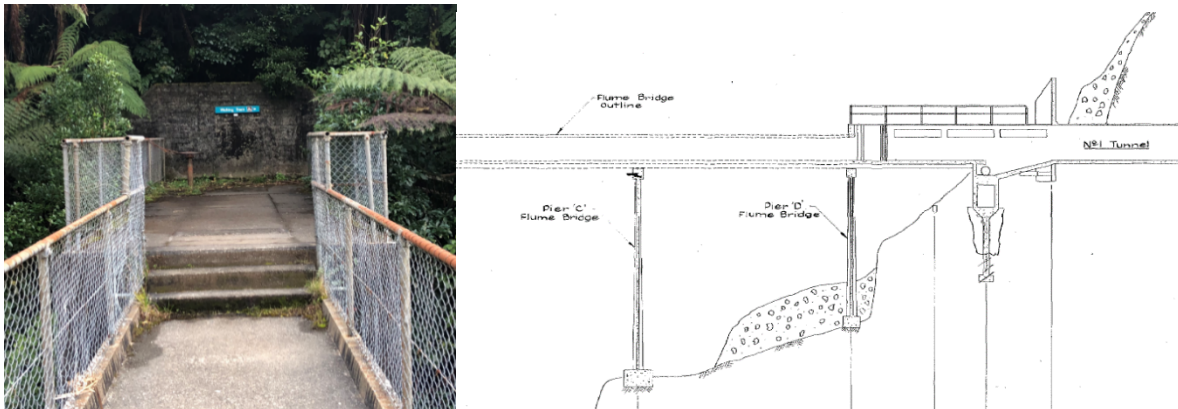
The gravel trap that connects the flume bridge to the Tunnel 1 portal
